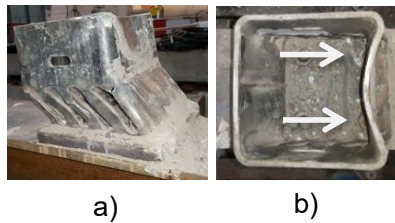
Deformed shape of YP of SP1A and bolts' bearing on wall
